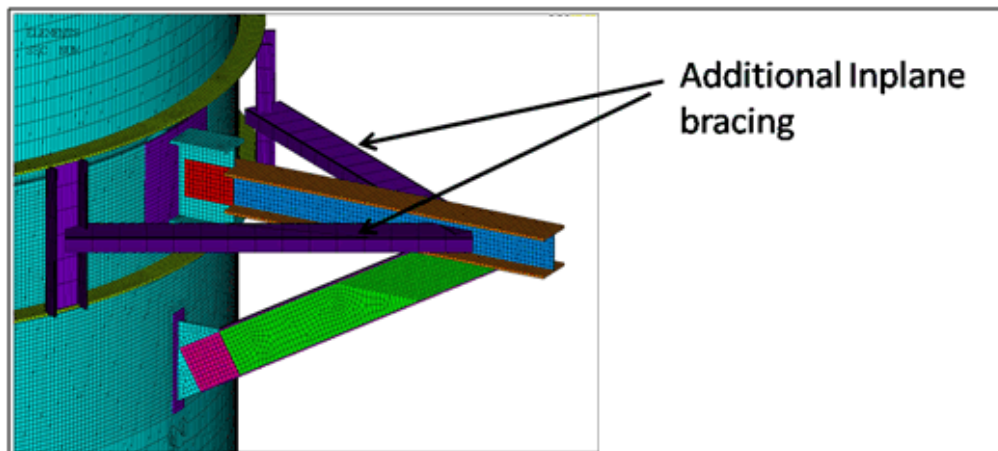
A snapshot of Support Structure Modifications carried out at Site
